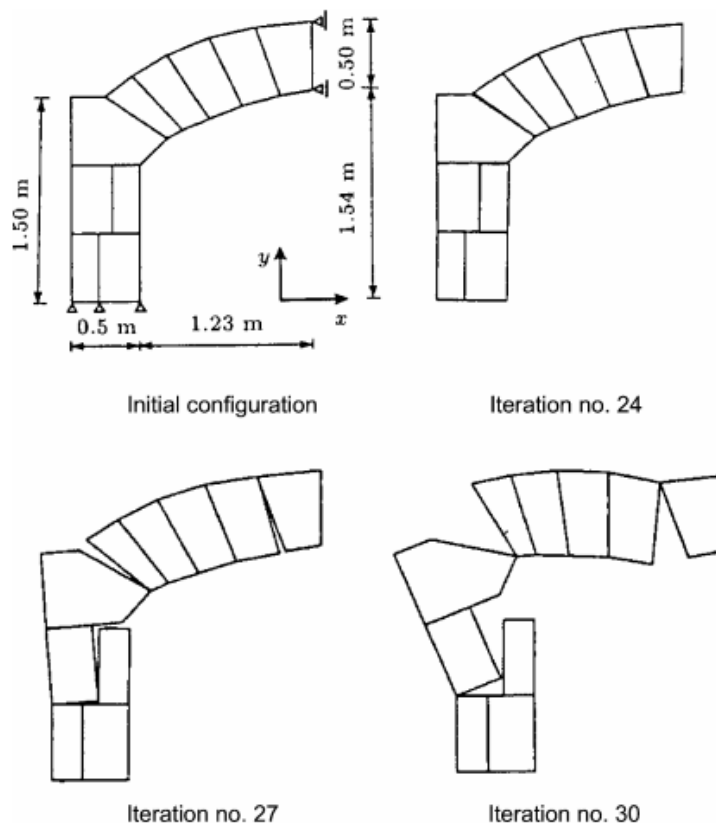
Failure mode of a masonry arch. Source: Mamaghani et. al. [15].
